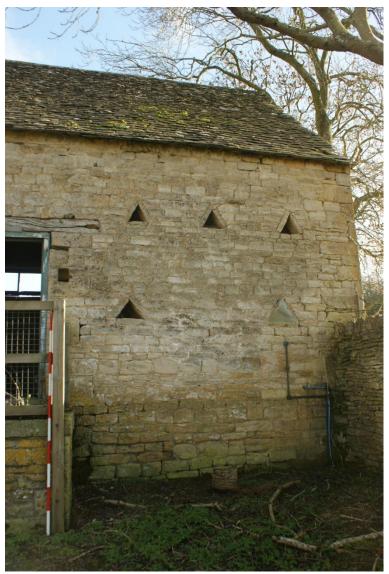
Phase 2 with sotch form a wall plate of a former building next to the threshing door jamb, looking east
